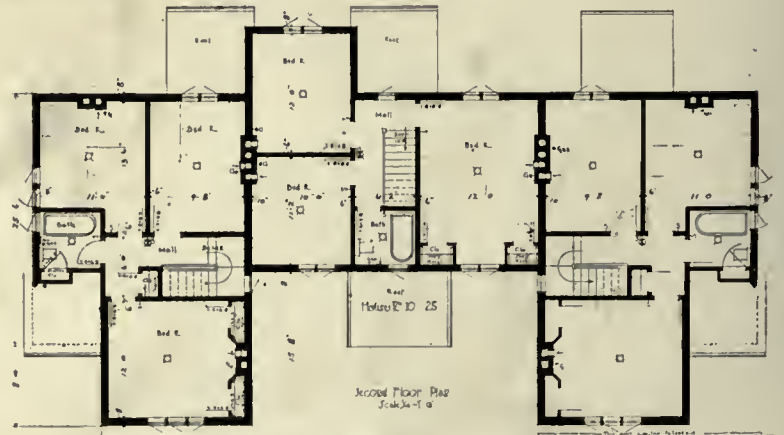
Second Floor Plan, Triple House Block, Fig. 6
